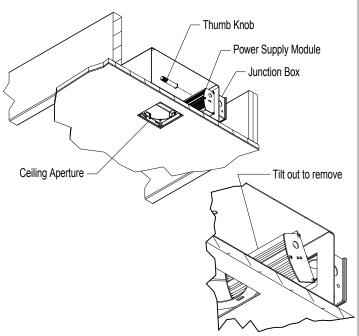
Remove Thumb Knob & Disengage Power Supply Module
